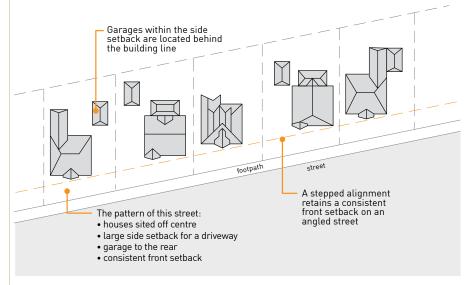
C.2-1: Retain the streetscape pattern of building siting.
